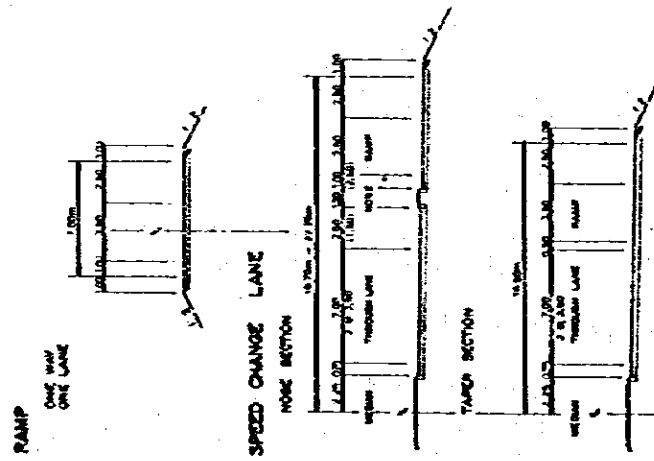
TYPICAL CROSS SECTION OF RAMP
